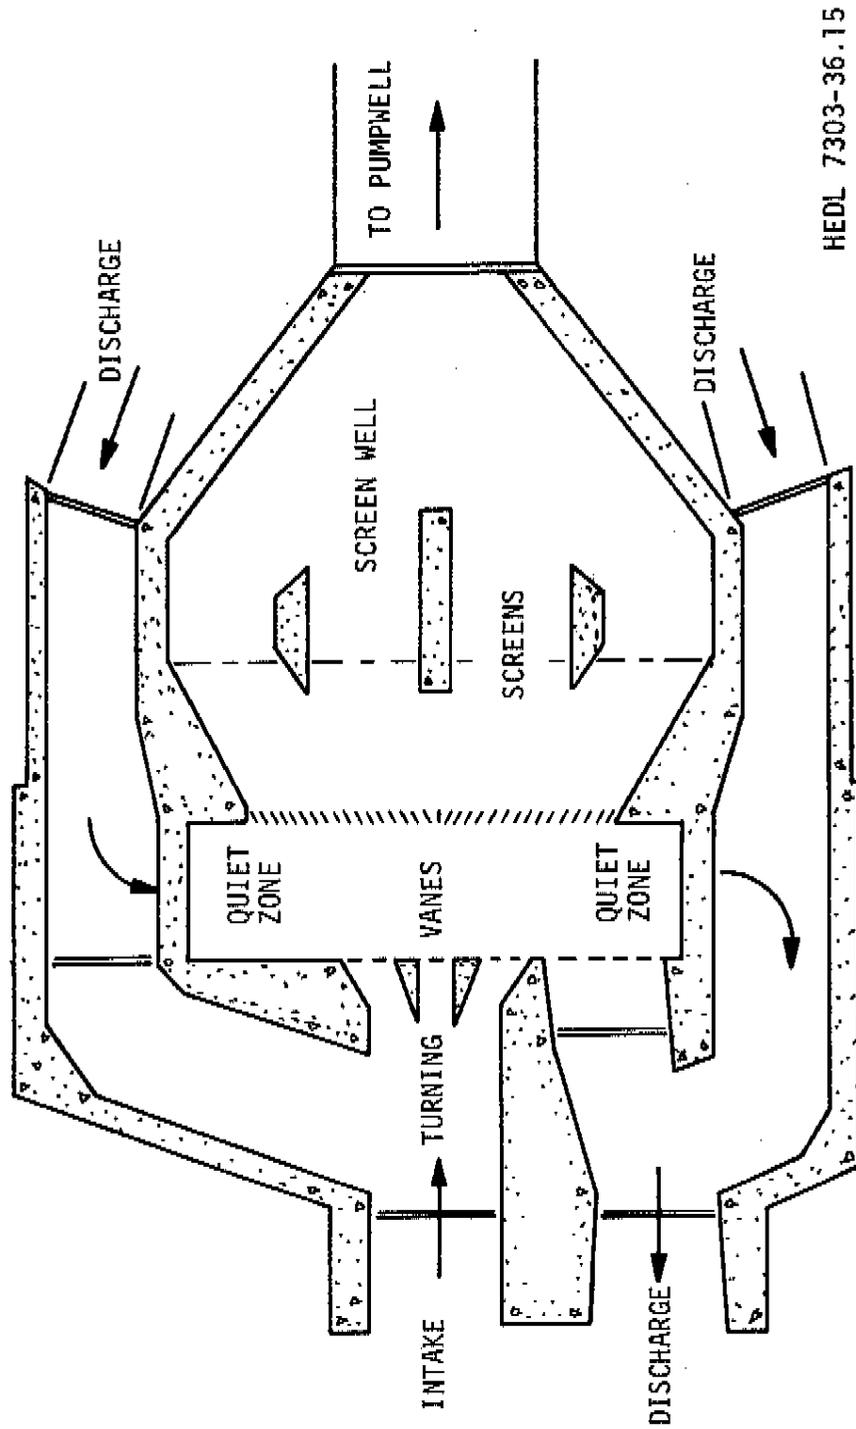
Plan View of Screenwell Used at Huntington Beach Steam Electric Plant.
